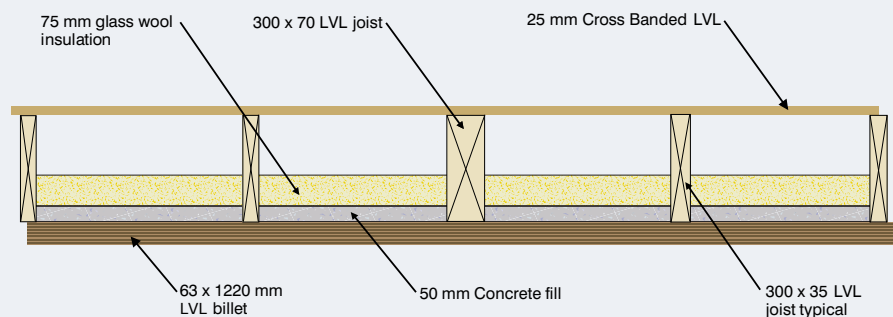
Cross-section of LVL floor cassette with concrete and insulation fill.
